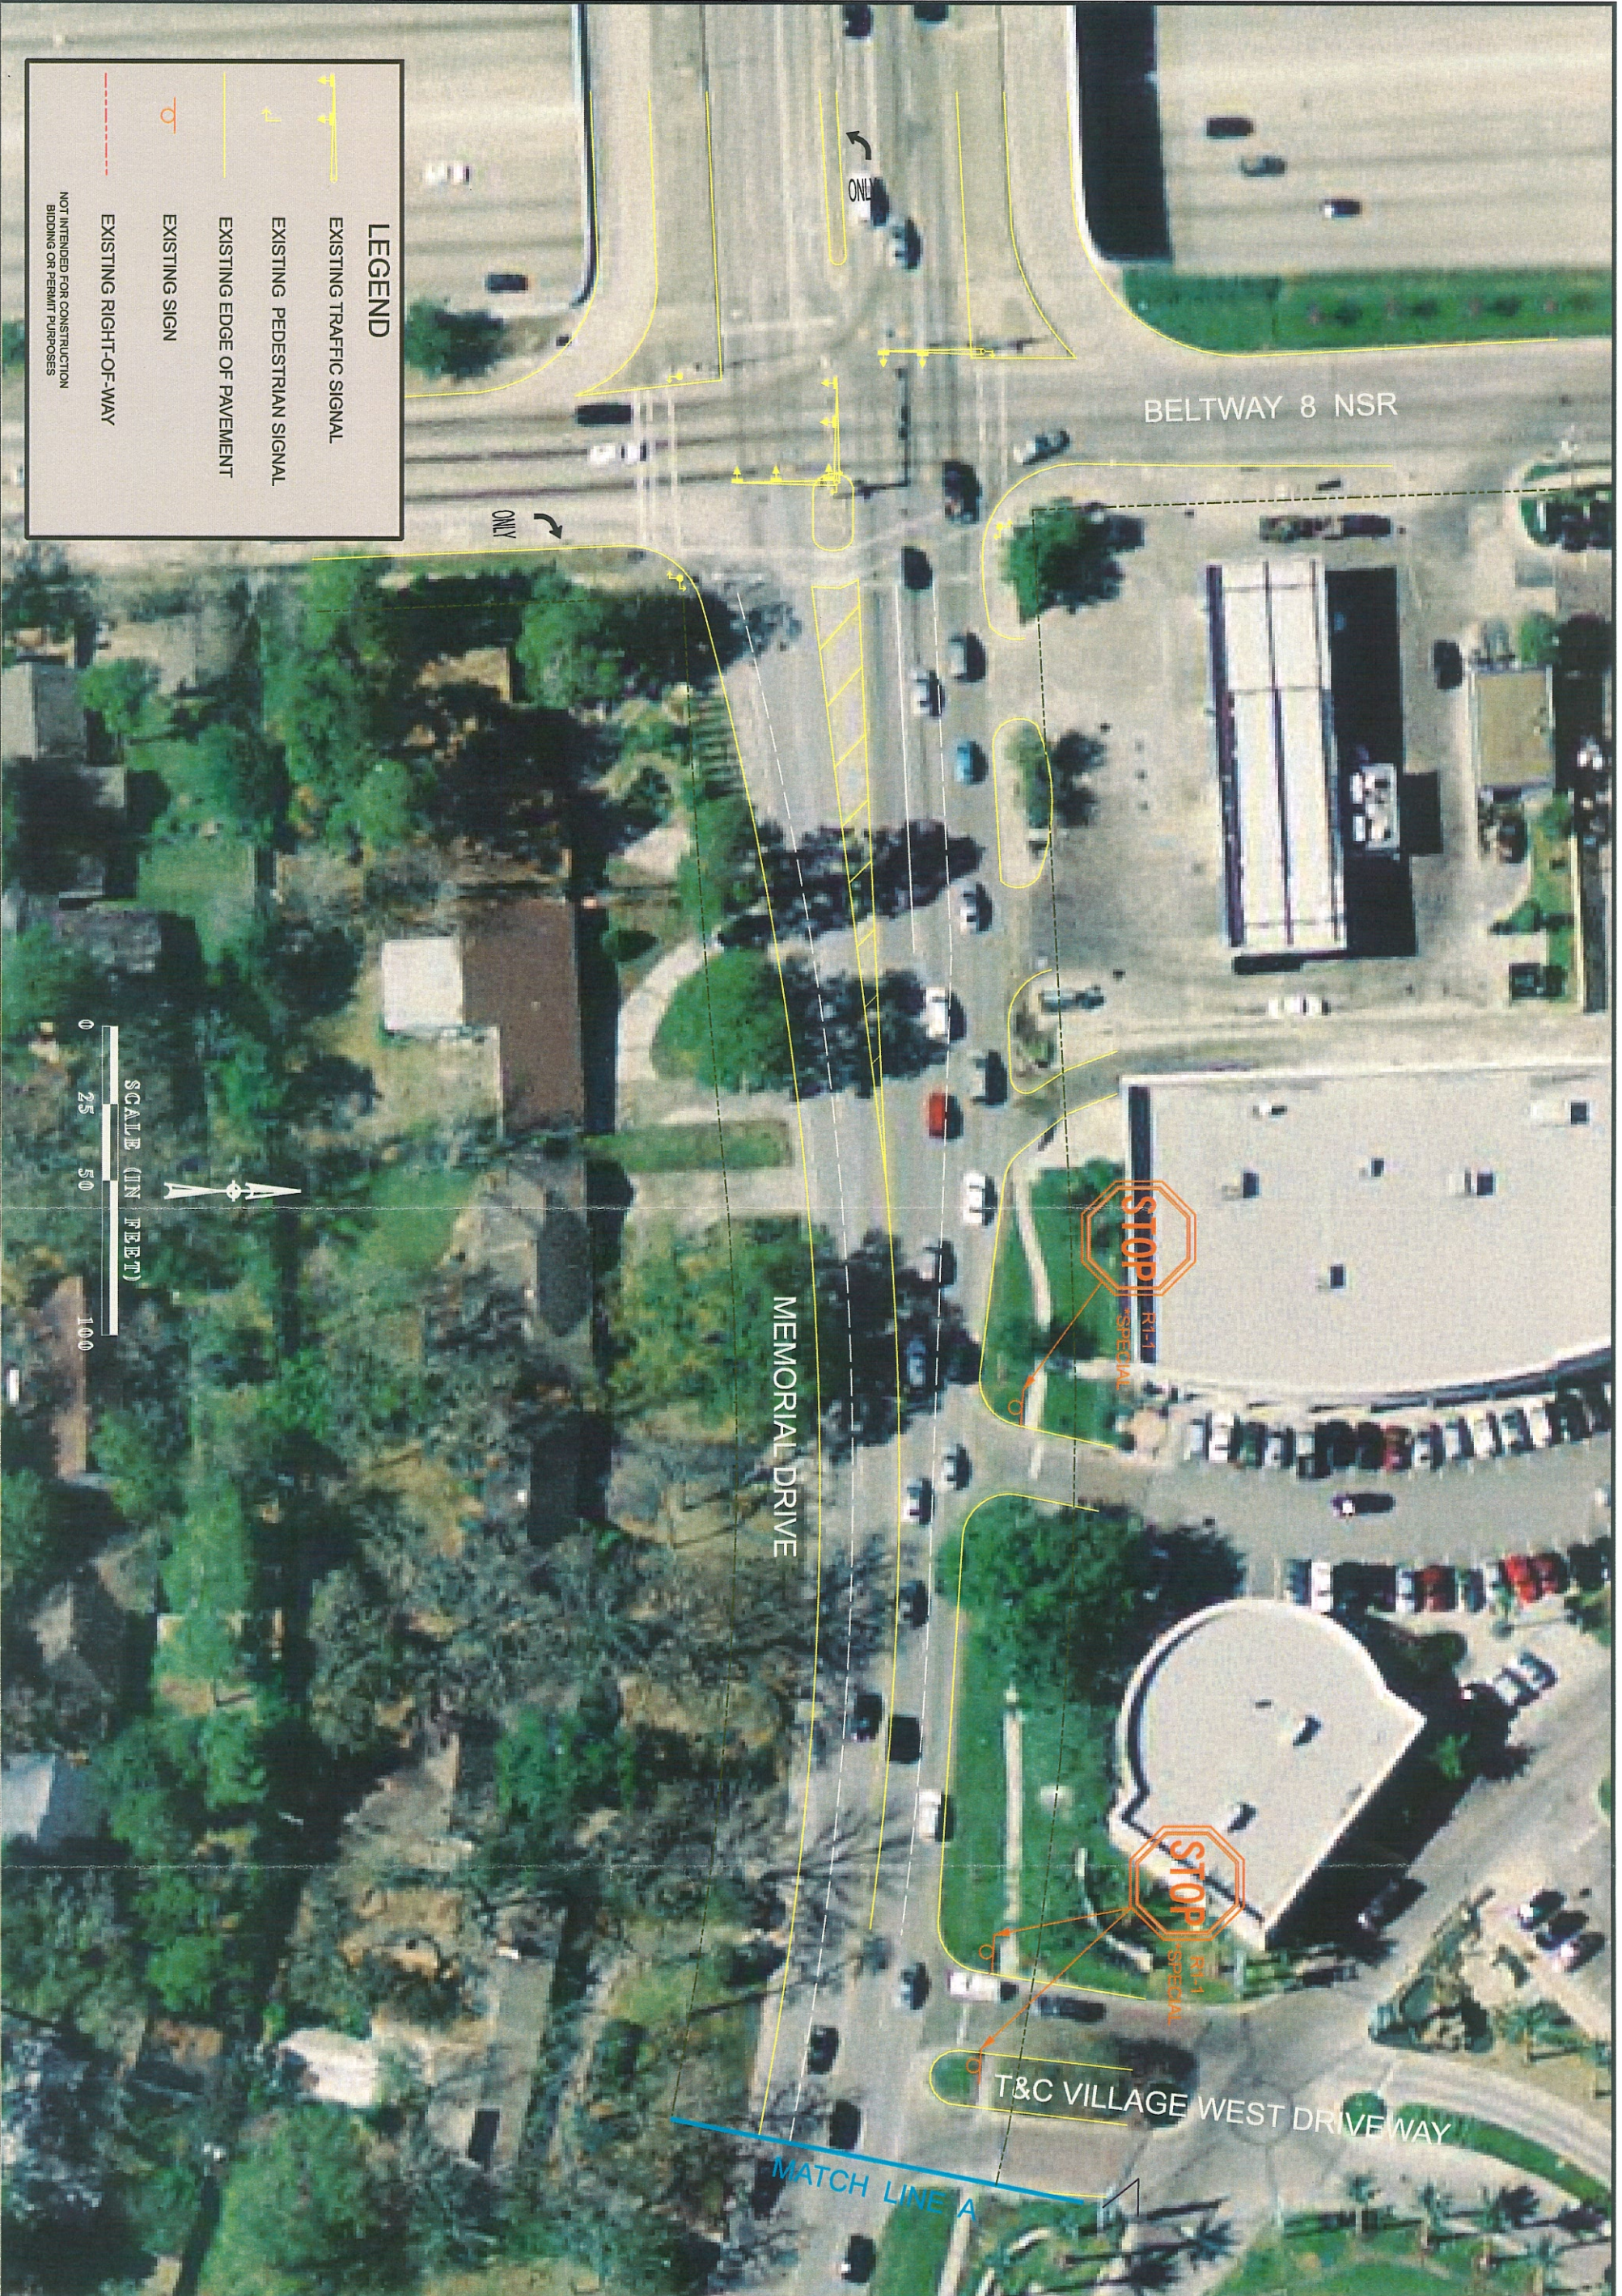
WEST DRIVEWAY EXISTING CONDITIONS
